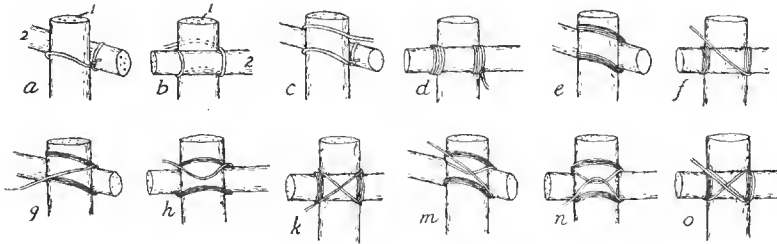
Lashing of collar beam to main post: 1, main supporting post; 2, collar beam; *a*, the braid end is fixed with the slip knot commencement around the collar beam, and the braid makes a transverse turn around the back of the post from right to left. The turn is not exactly horizontal with the lower edge of the collar beam, but is arched above that level. *b*, The braid appears below the beam in front and turns directly upwards over it to the back; *c*, it repeats a higher transverse turn around the post at the back at a higher level from left to right when it passes forward above the beam; *d*, passing downwards around the beam it comes to the back of the post to repeat the turn in (*a*). The turns are repeated in the order above until there are 2 sets of 4 transverse turns around the collar beam; *e*, there are also 2 sets of transverse turns around the post. The higher level of these turns must be observed. This counteracts sagging. The rough scumit does not slip on wood so readily as a smooth cord. *f*, Diagonal turns are now used. The braid is brought up from the right lower corner diagonally across the outer surface of the collar beam to the left upper corner where it passes back behind the post. *g*, Behind the post, the braid forms a curve by being directed downwards to the middle line to just below midway between the sets of turns; *h*, it is then curved upwards to complete the curve, and goes forward above the beam; *k*, appearing at the right upper corner, it crosses the tie beam diagonally to the left lower corner, where it passes back around the post; *m*, appearing from below the beam, it forms a lower curve by passing obliquely upwards on the back of the post to cross the upper curve; *n*, it turns downward to complete the curve by passing forward under the collar beam. The middle of the lower curved loop has crossed the middle of the upper loop. It fixes it down and counteracts any tendency for the upper loop to slip upwards, and, at the same time, gets a better grip on the rough material of the loop beneath. This is a common practice in Samoan technique. All loops and turns are tightly and firmly applied with the right hand while the left thumb presses the end of the turn against the woodwork when the pull is finished. *o*, The braid appears in the right lower corner beneath the beam, and makes a diagonal turn upwards across the beam. This is position (*f*). The turns are repeated to make 4 in each diagonal over the beam, and in each loop over the back of the post. After the first diagonal turns, the others are made alternately above and below the first.
